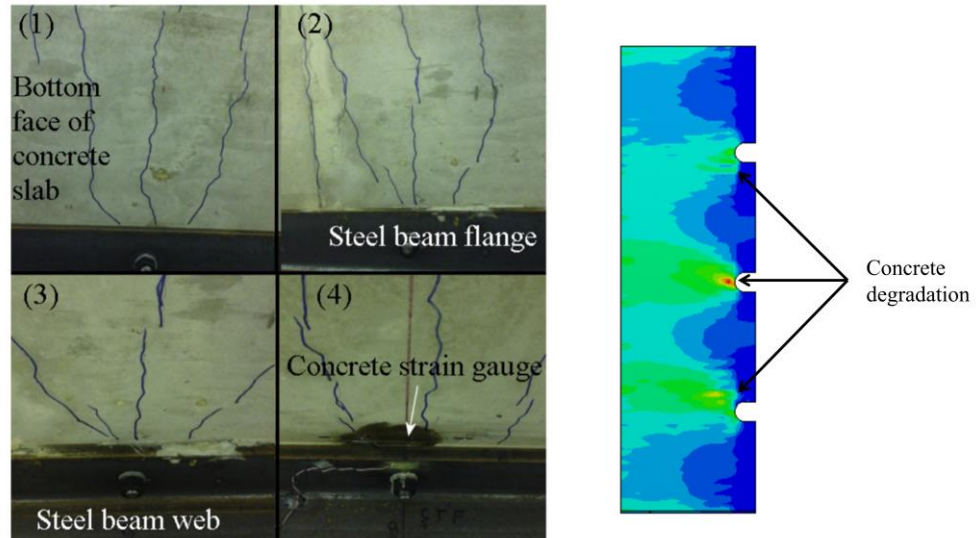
Concrete cracks at the bottom of the slab.
